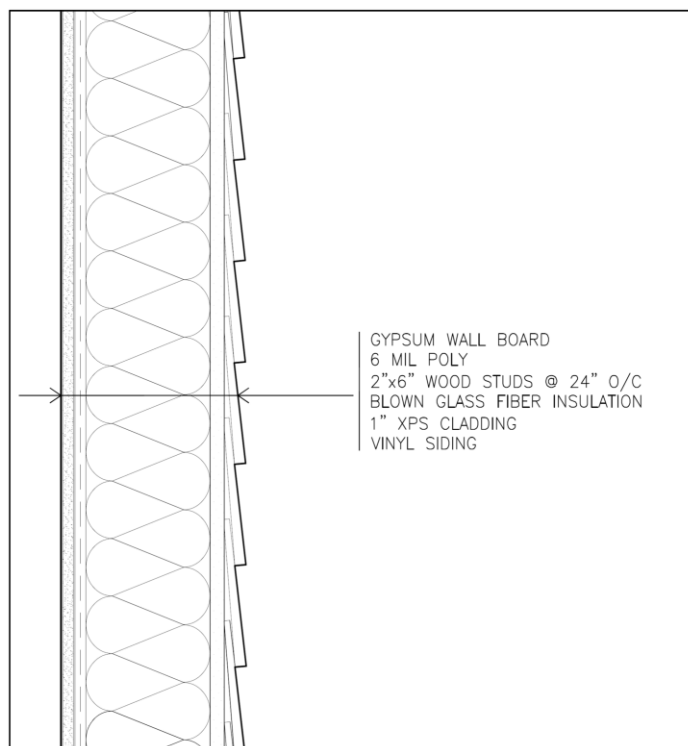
Wall Assembly Cross-Section (Twiddy, 2011)
